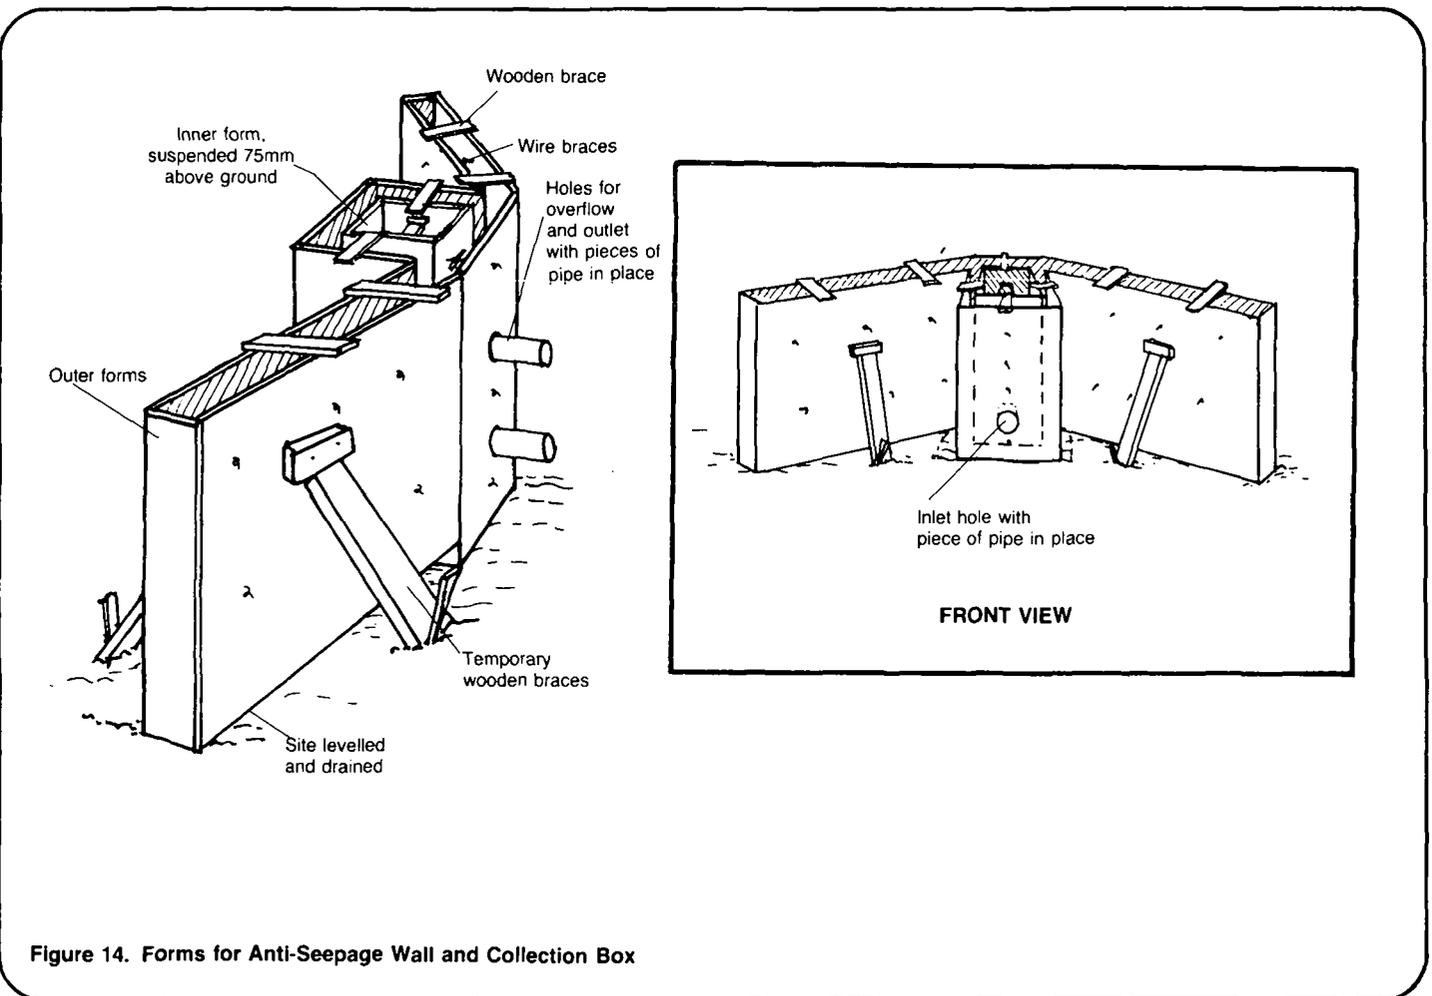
Forms for Anti-Seepage Wall and Collection Box
